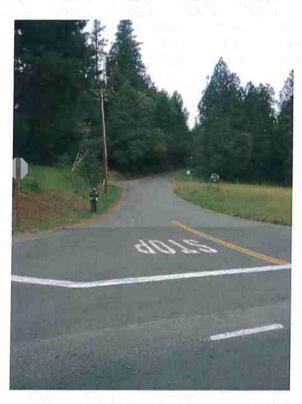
Brannan Mountain Road (BMR) PM 0.0, 36-ft. wide paved surface with a longitudinal slope of less than 5% at the intersection with Highway 96, Willow Creek, CA.
